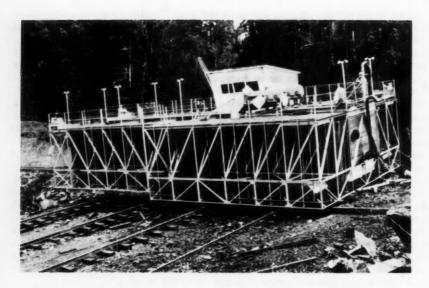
UPPER BAKER FISH COLLECTION BARGE ON LAUNCHING RAMP
